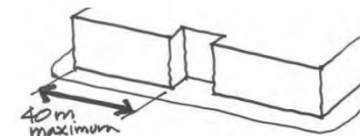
Limit the visual mass of building façades to lengths of 40 m or less.
